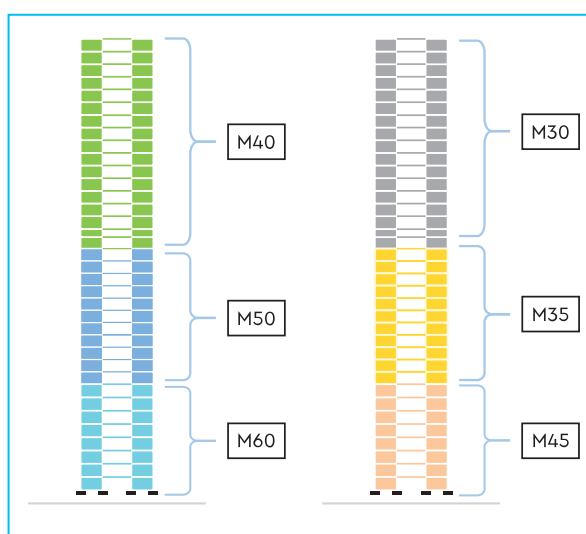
Elevation Showing Concrete Grade variation in Slabs/Beams Alternatives 03 and 04
